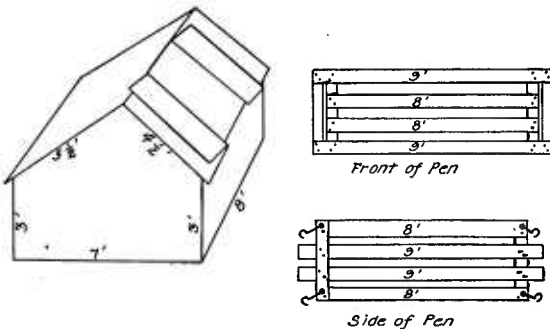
Diagram of individual house shown in figure 18, showing dimensions and details of pen construction.
